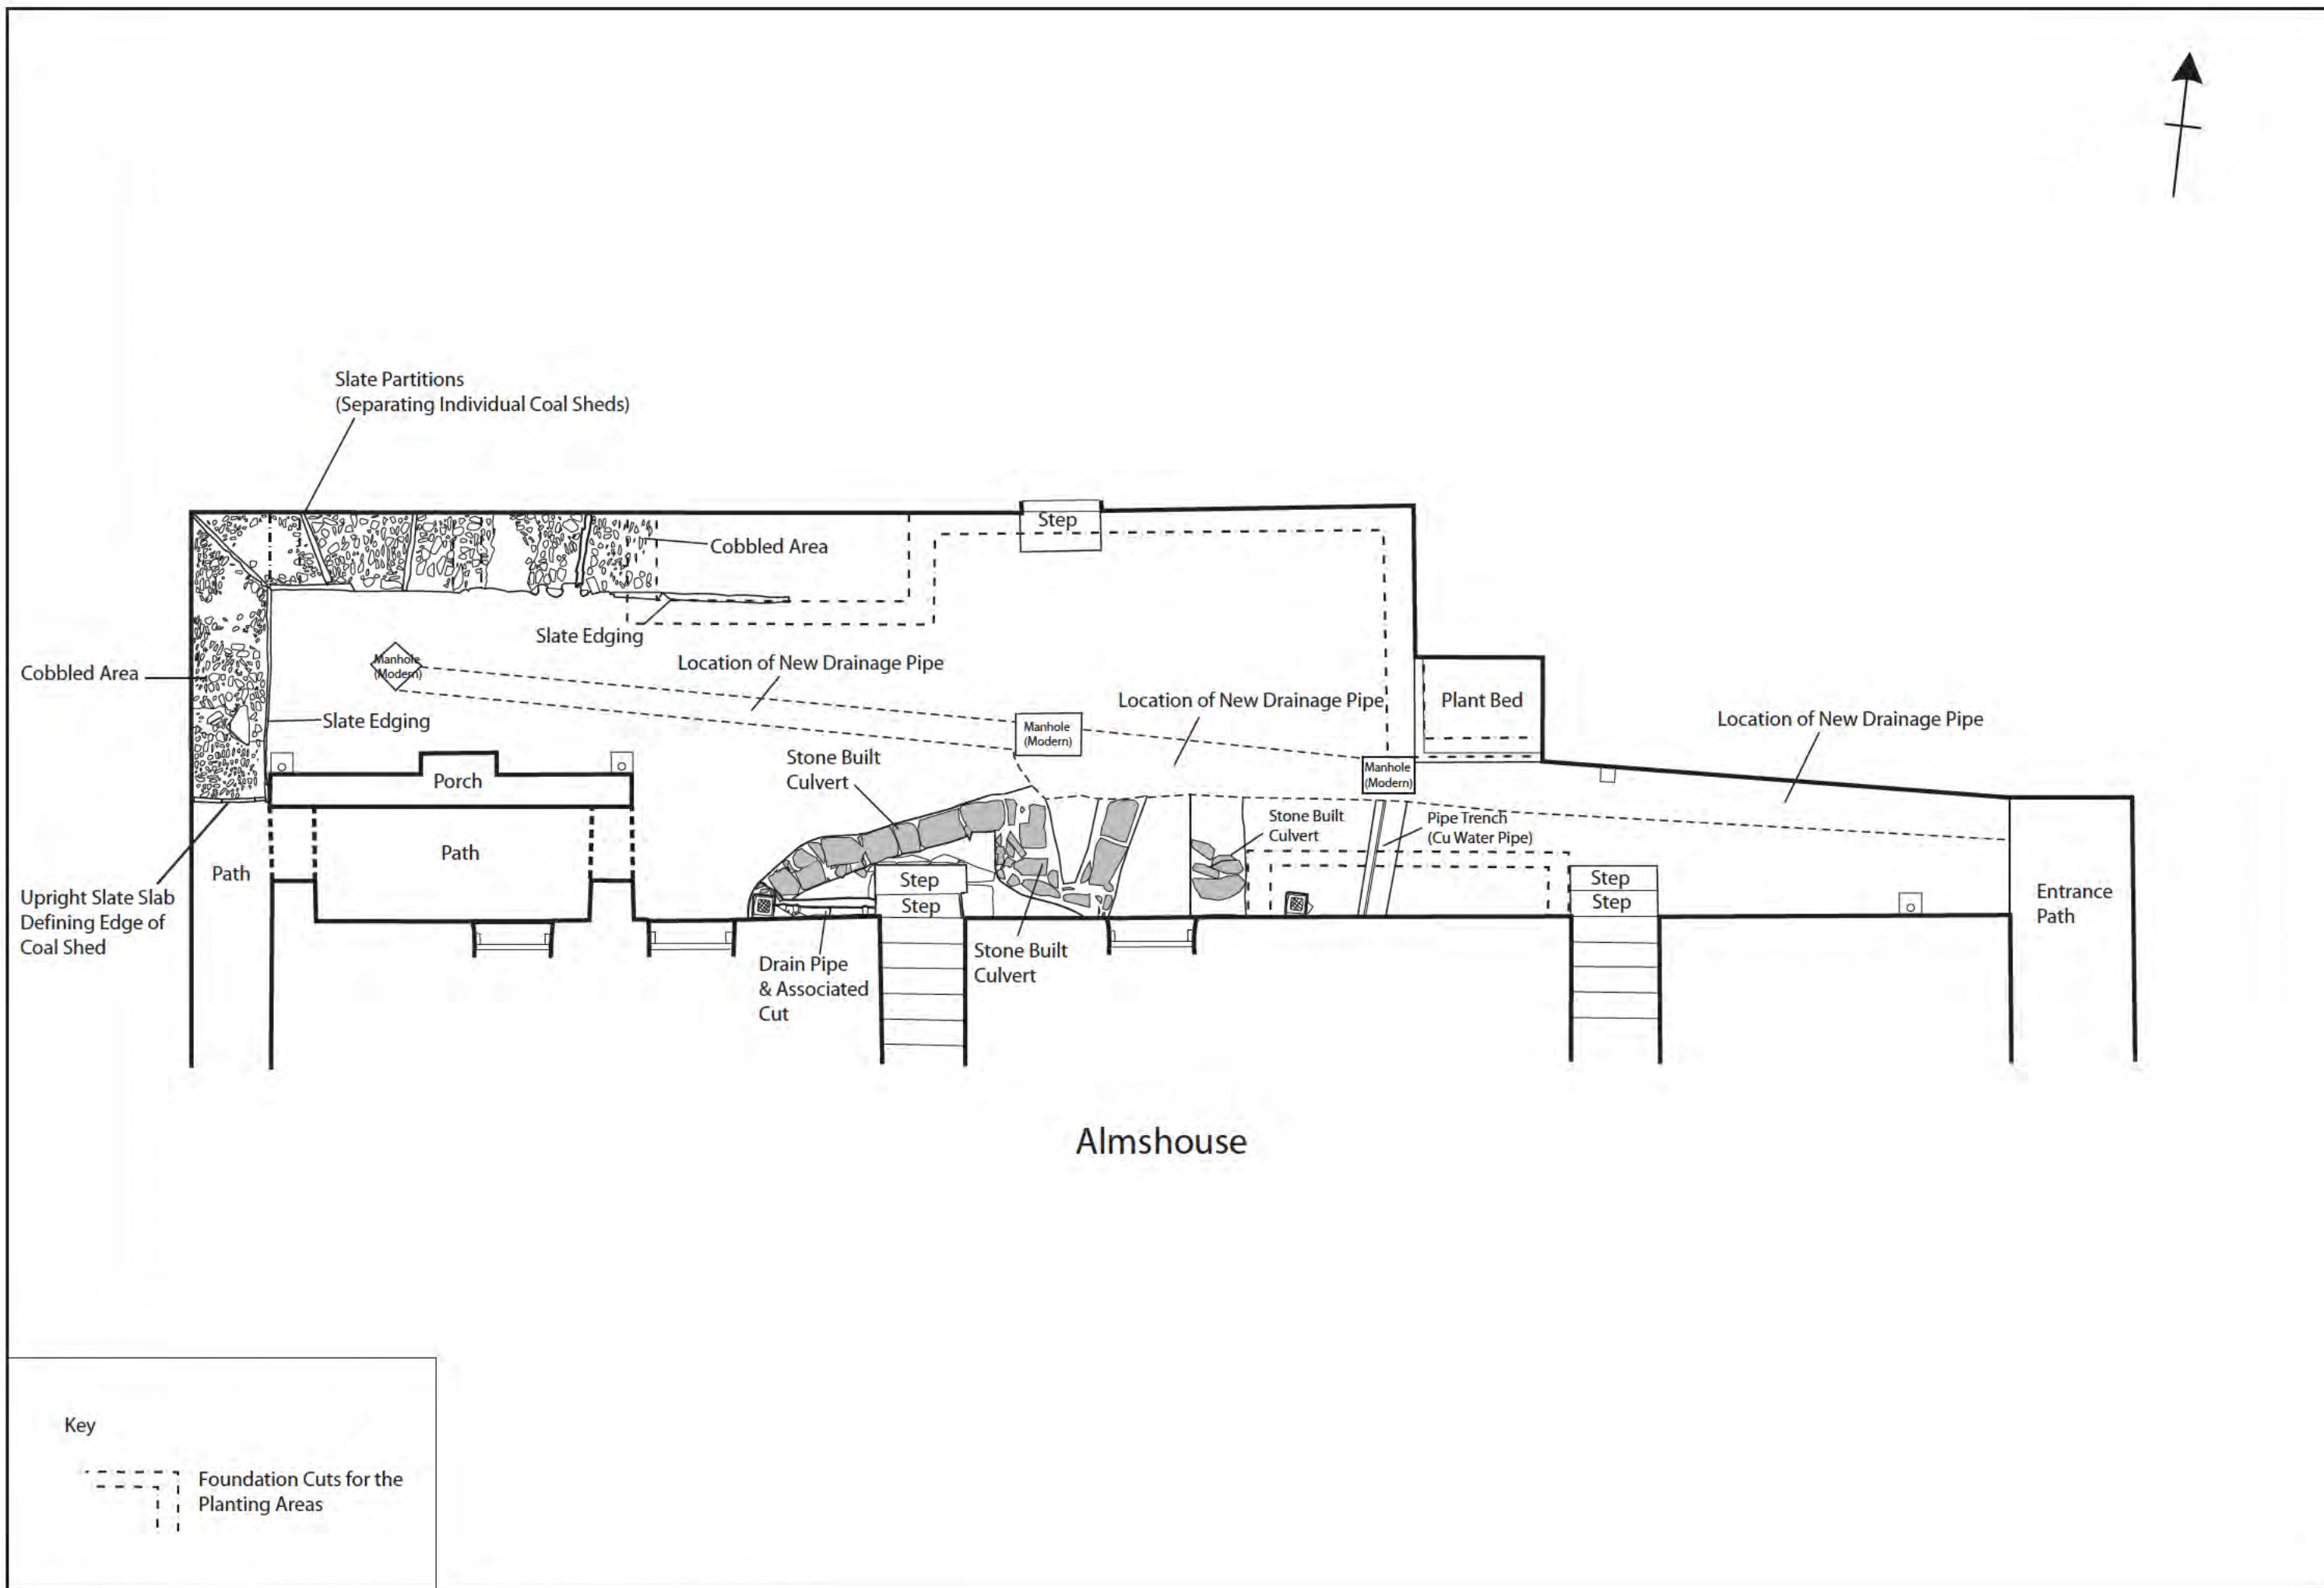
Plan of Watching Brief Area to the Rear of Llanrwst Almshouse (Scale 1:80 @ A3)
